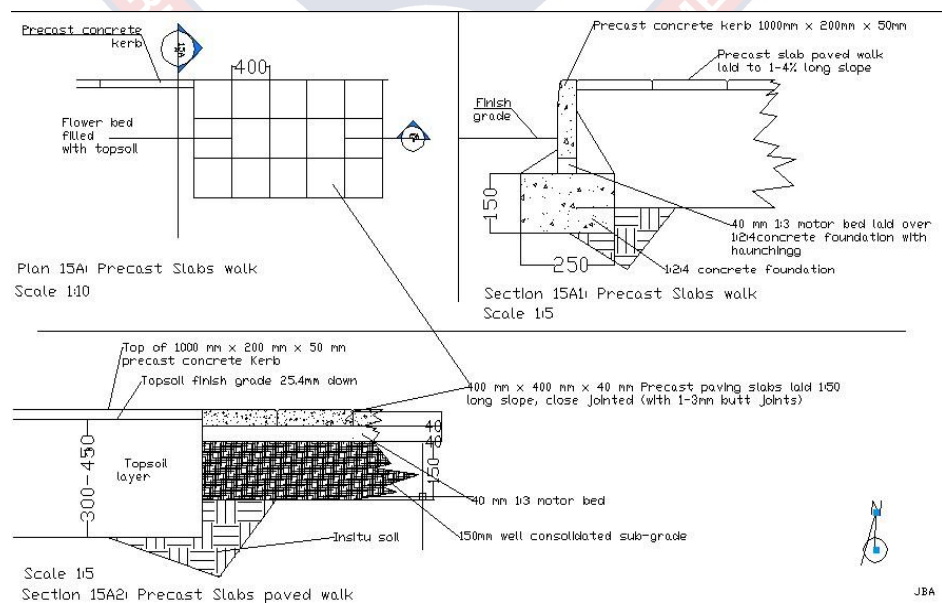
8: Detailing LLSite1 15A -Jointed Slabs walk, Edging and Flower bed
